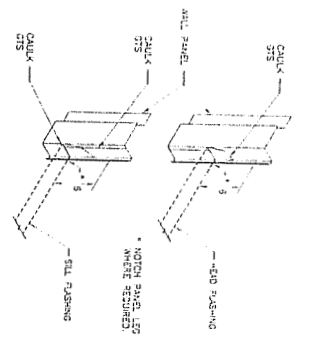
DETAIL AT JAMB FOR FIELD LOCATED FRAMED OPENING
